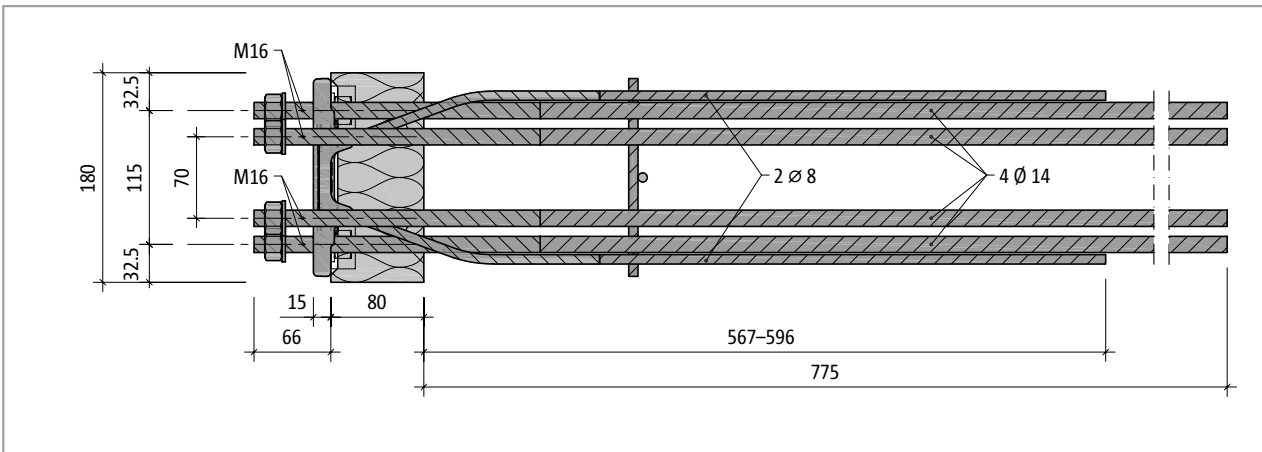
Schöck Isokorb® T type SK-MM1-VV1: Plan view
